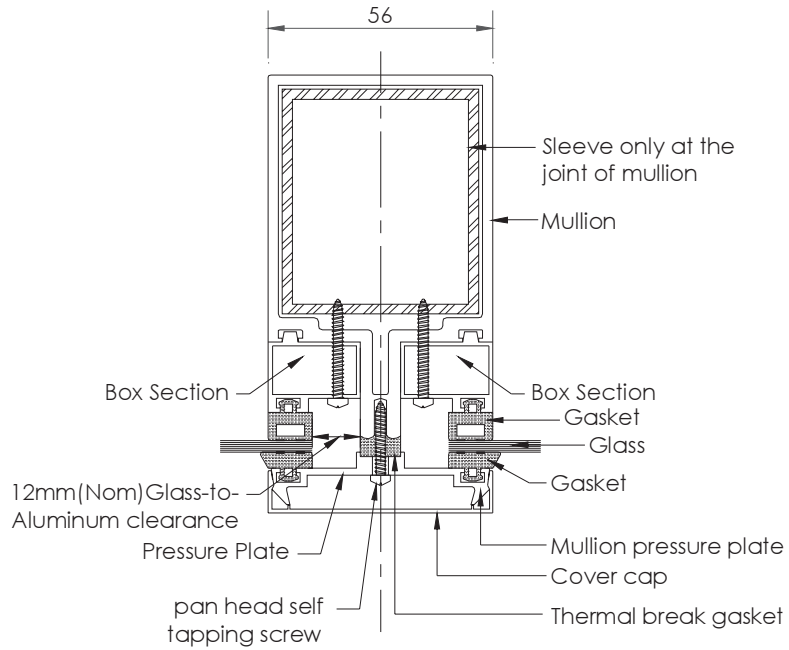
CURTAIN WALLING - GLASS FIXING DETAIL
